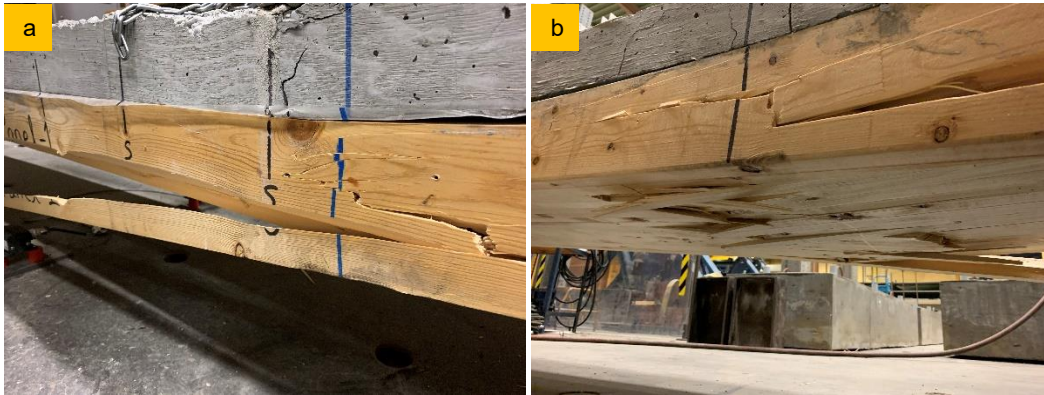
Timber fracture in specimen (#1) GLT6-C100-I0-45°-S250; a) side view and b) bottom view
